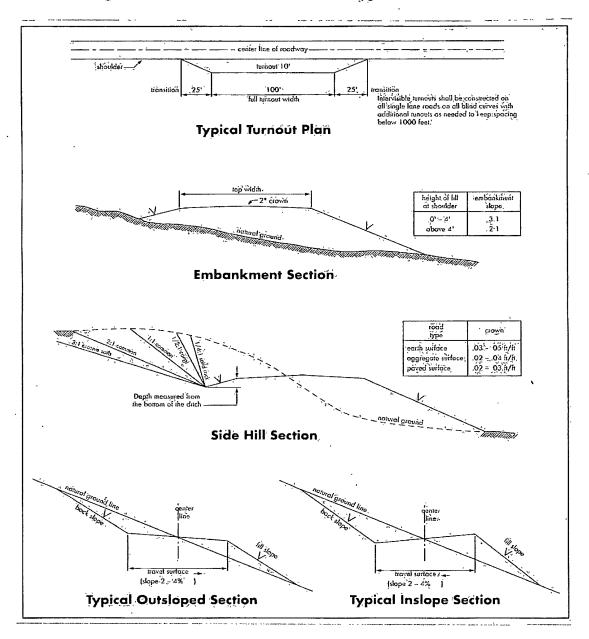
Cross Sections and Plans For Typical Road Sections .
